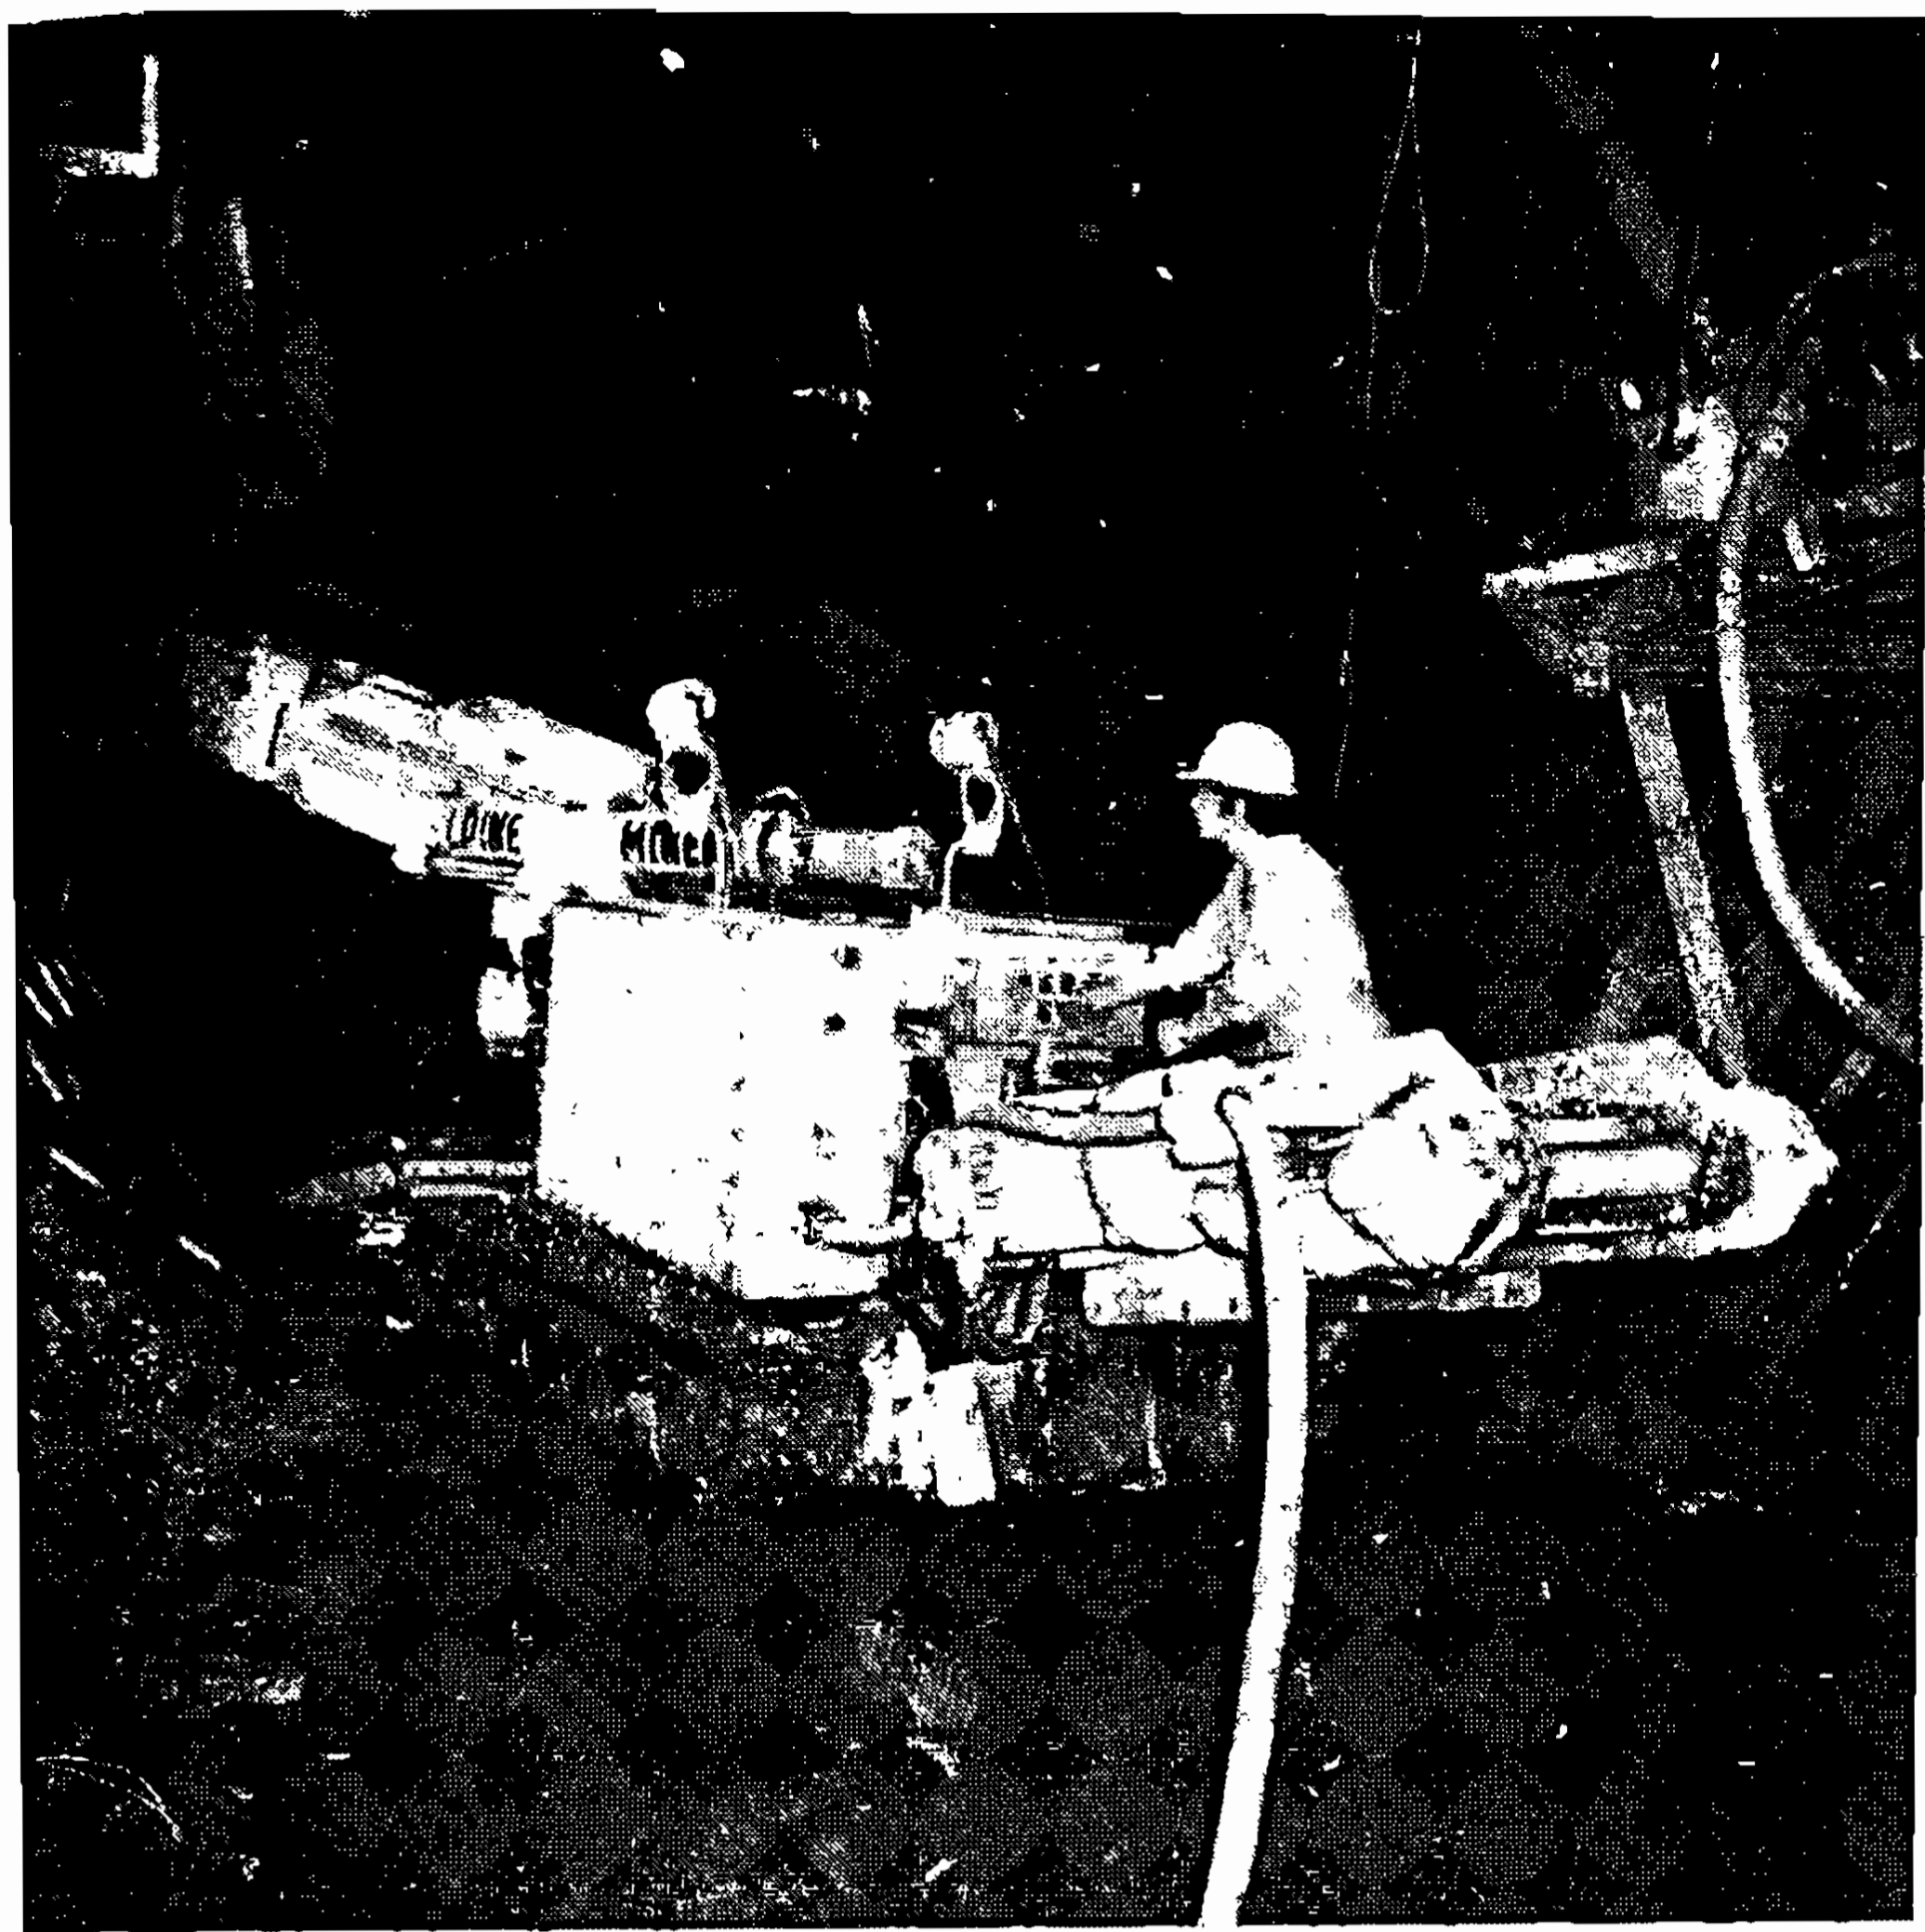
Treasury Gardens Pilot Tunnel with Road Header Machine
